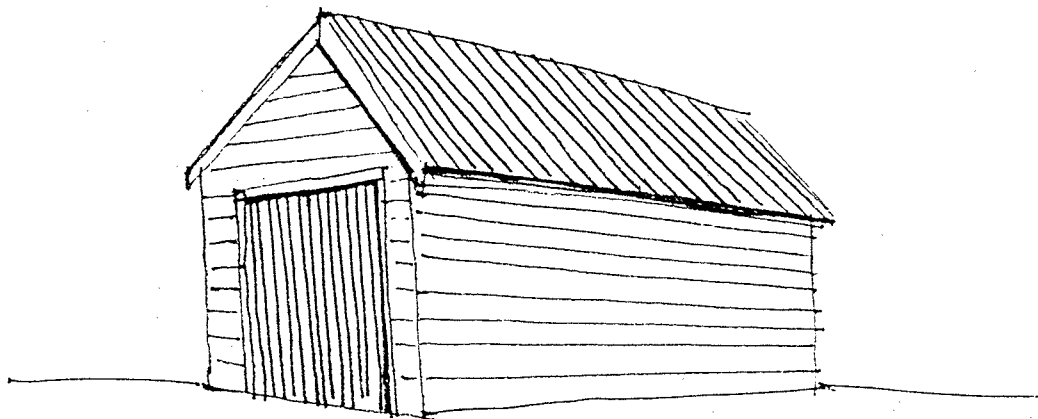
DARKER ROOF COLOUR THAN WALLS
